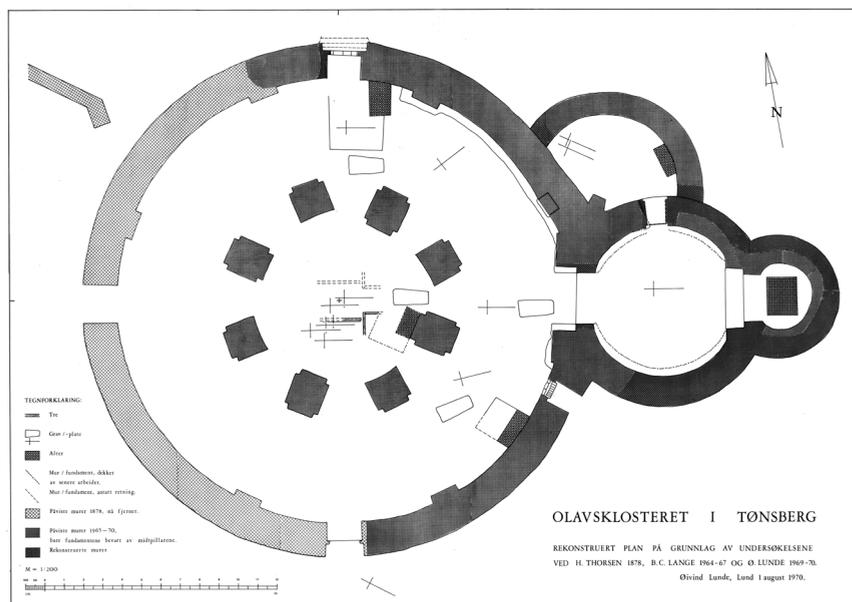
Reconstructed church plan. Illustration: Ø. Lunde.
